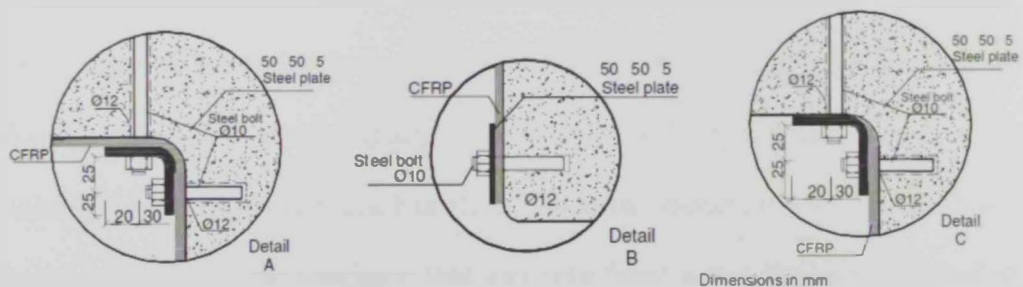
Anchorage details of strengthening specimen beams (Tanarslan and Ertutar 2008)
